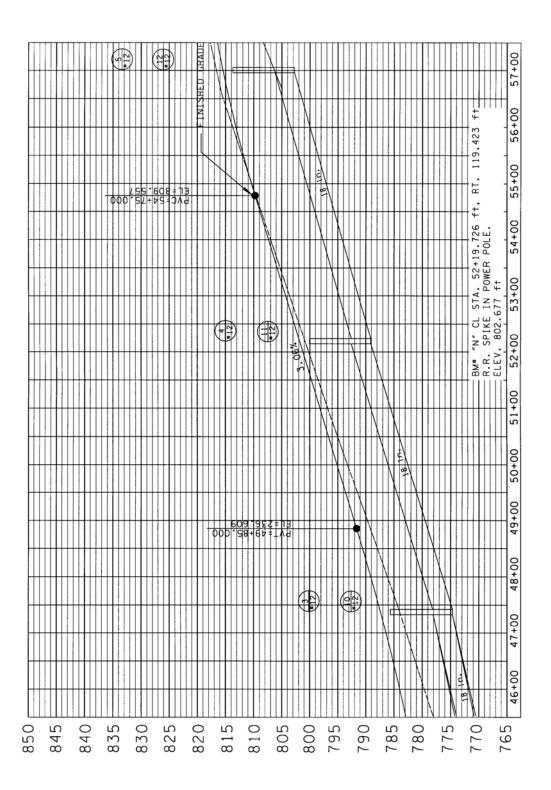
A-15. Portion of Proposed Layout Sheet (Storm Sewer Profile)
